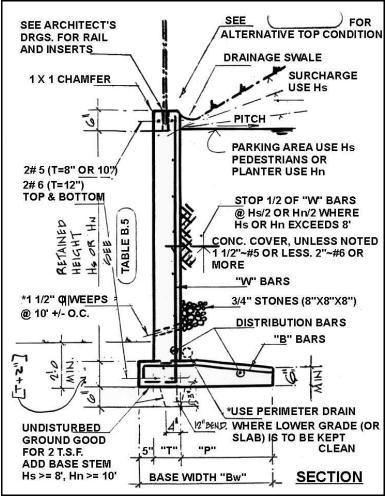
Concrete cantilever retaining wall, toe in. Height = 4 to 14 feet (Bernier, 1995).
